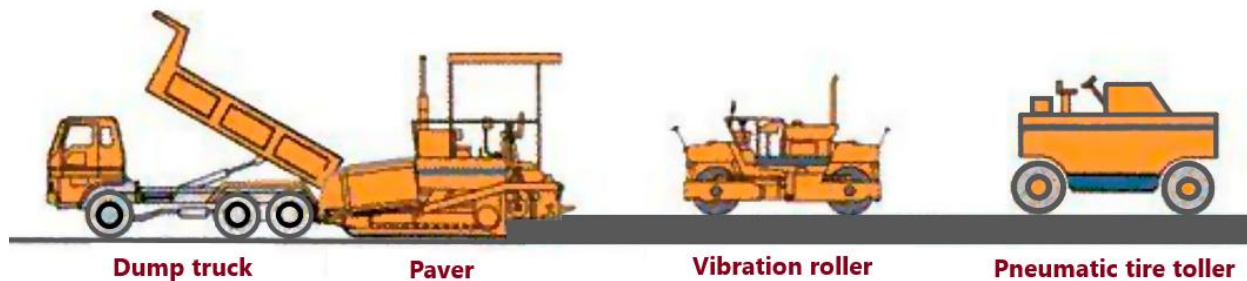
Machinery and equipment used for the construction of roller-compacted concrete pavement [6]
